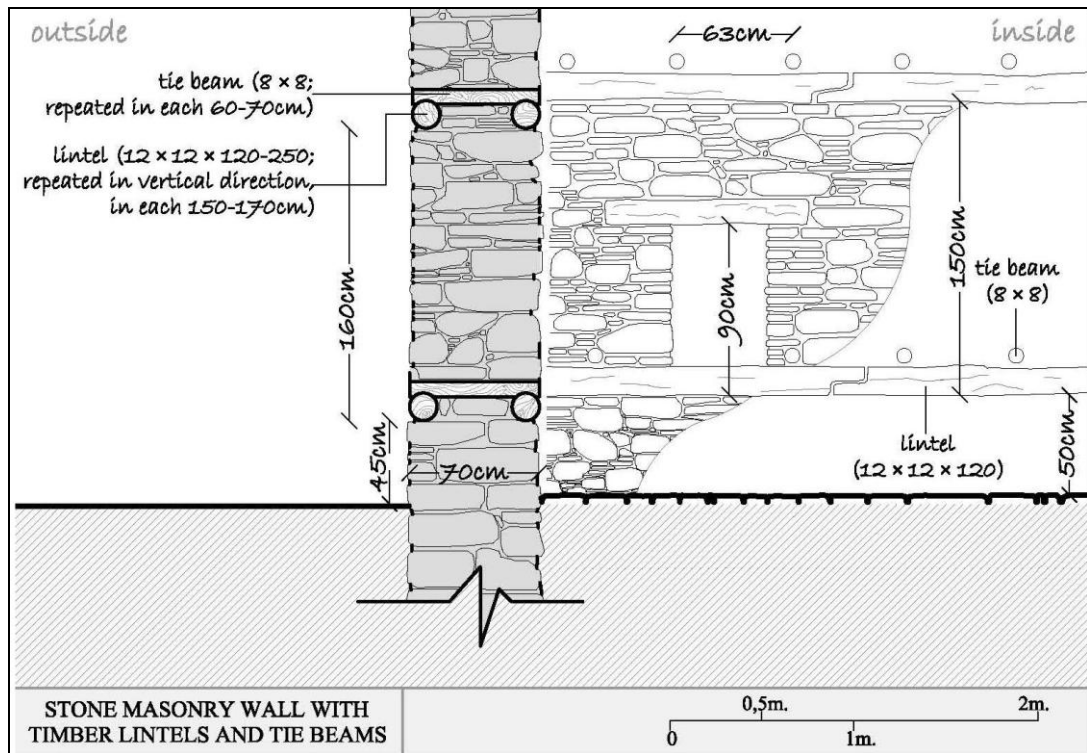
, Location of lintels and tie beams on masonry wall (Camikebir Quarter Okul Street No:2)
